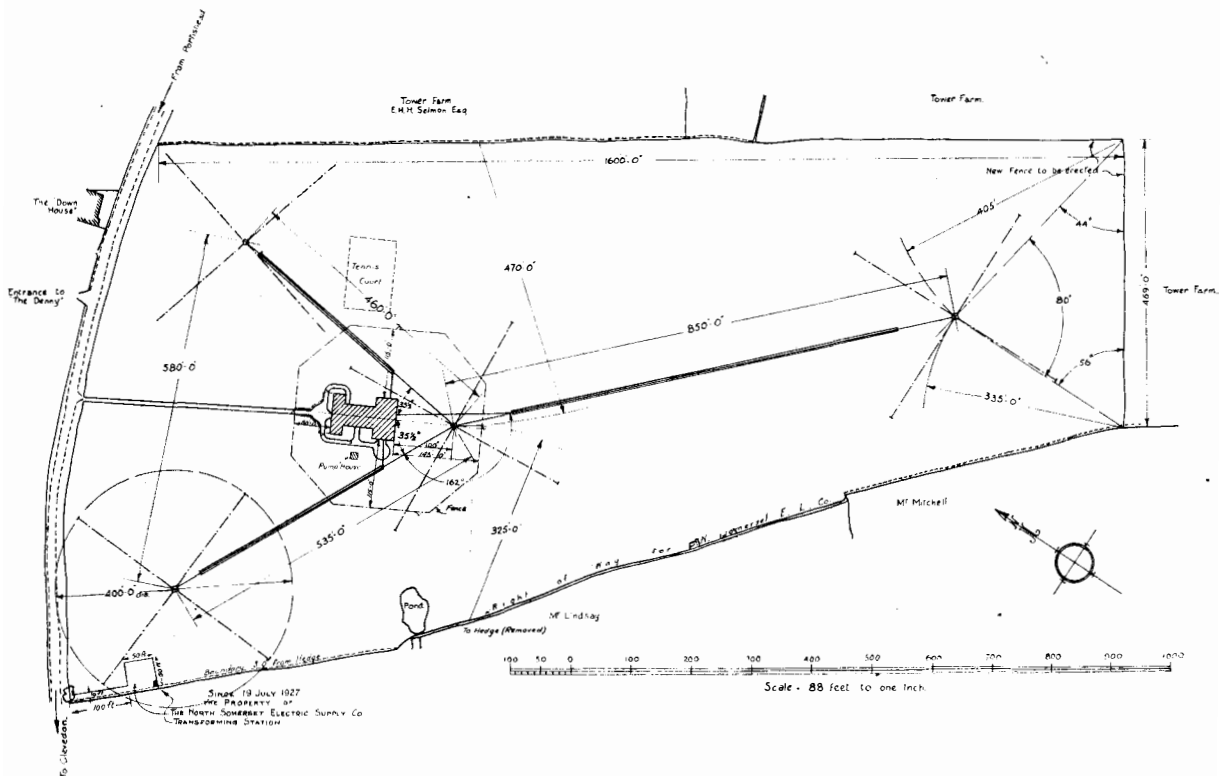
PORTISHEAD RADIO STATION. SITE PLAN.
